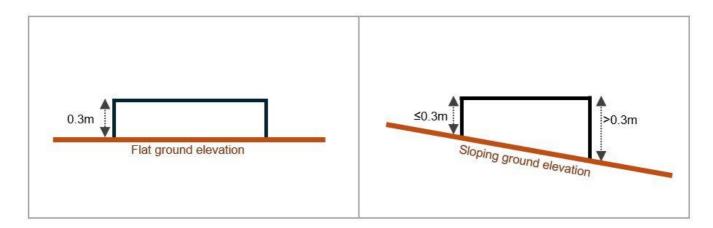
Cross-section profiles demonstrating how building upstands have been applied.
